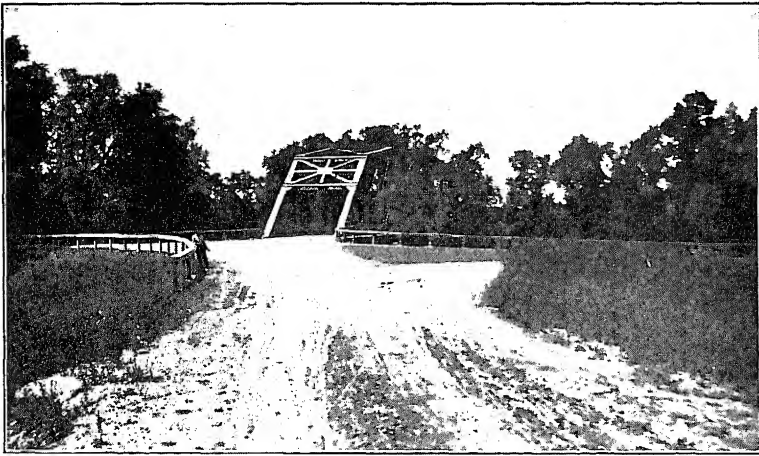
Substantial modern bridge with well designed approach protected with concrete guard rail.
